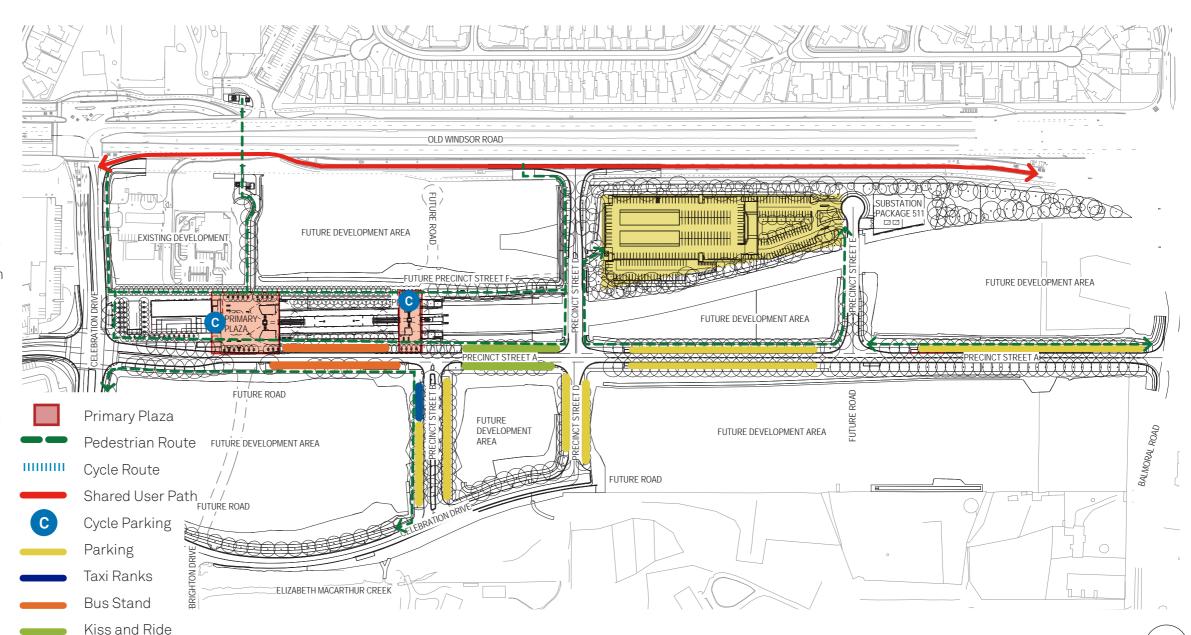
BLV\_Bella Vista Station Pedestrian and Cycle Plan. Source: HASSELL.
